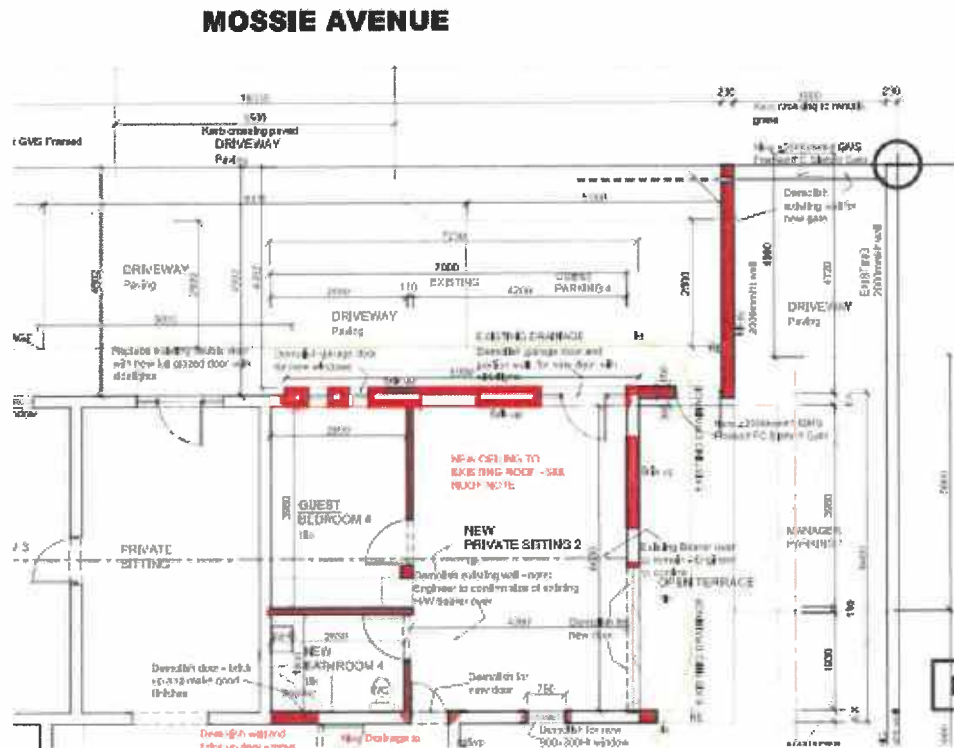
Position of the As Built unlawful structure / proposed guest bedroom no. 4, new private sitting room no. 2, new bathroom no. 4 and open terrace as indicated on the site plan
